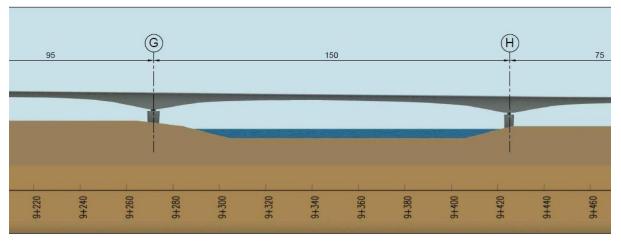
Section view of proposed bridge facing upstream with Dangan located on left side
